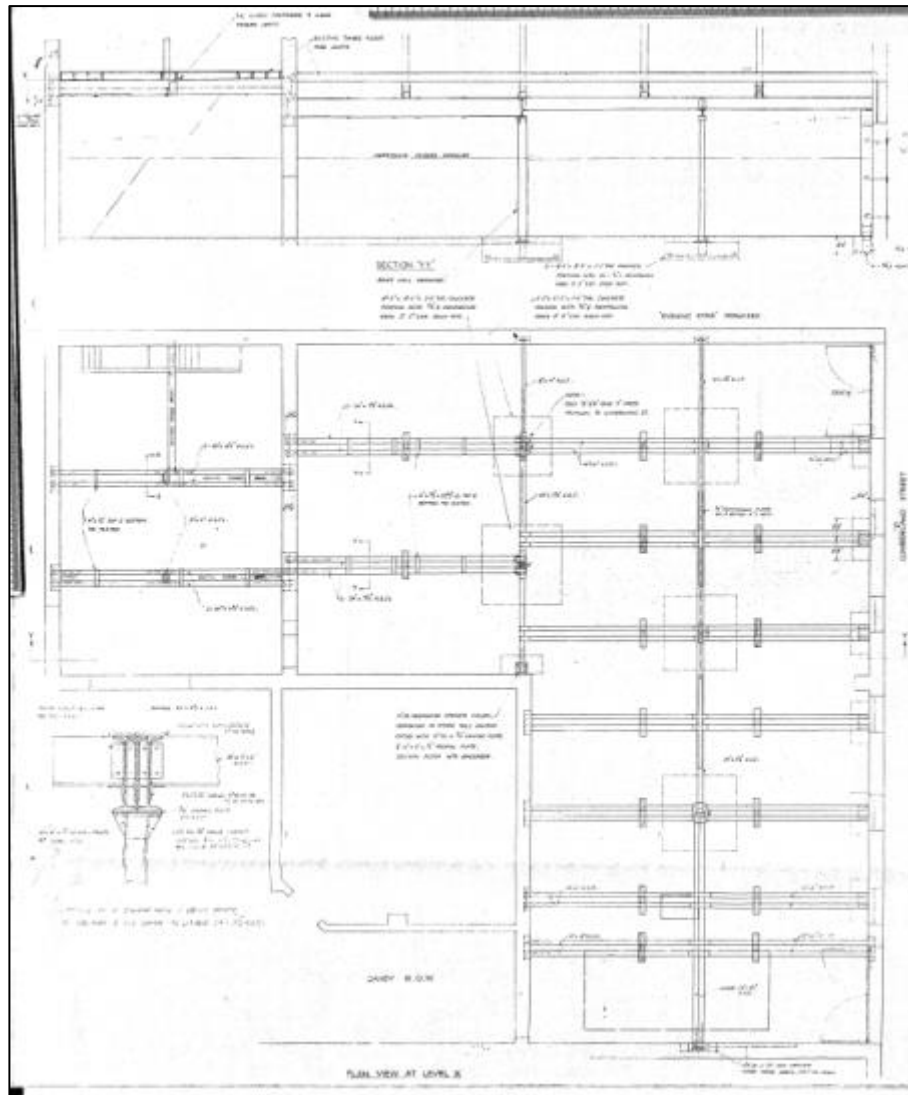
Reinforcement plans by Stevenson and Williams for the first floor of the grain mill (former granary/malt floor and kiln building) (DCC Archives Property Files).
